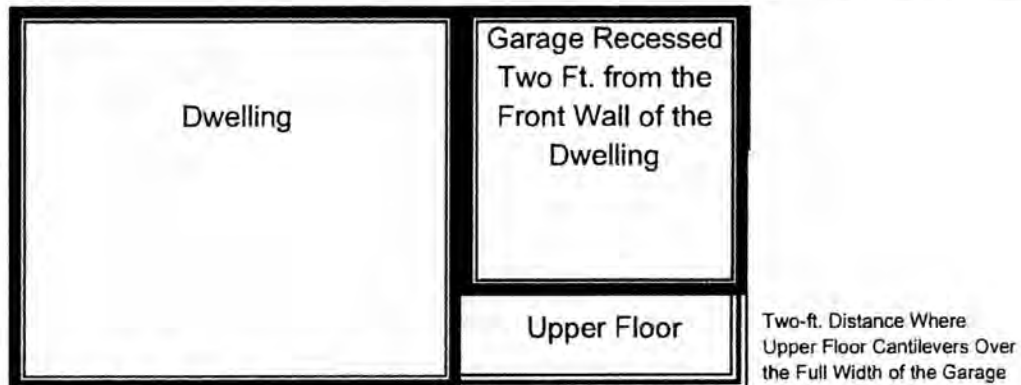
Garage Recessed and Upper Floor Cantilevers Over It
